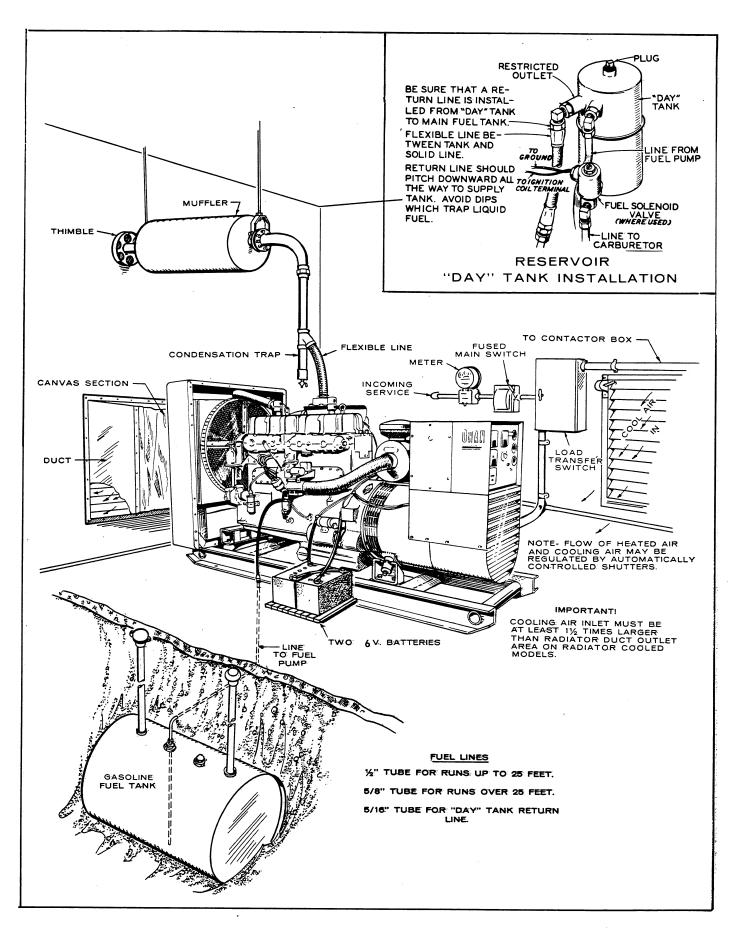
TYPICAL INSTALLATION — GASOLINE FUEL, RADIATOR COOLED
